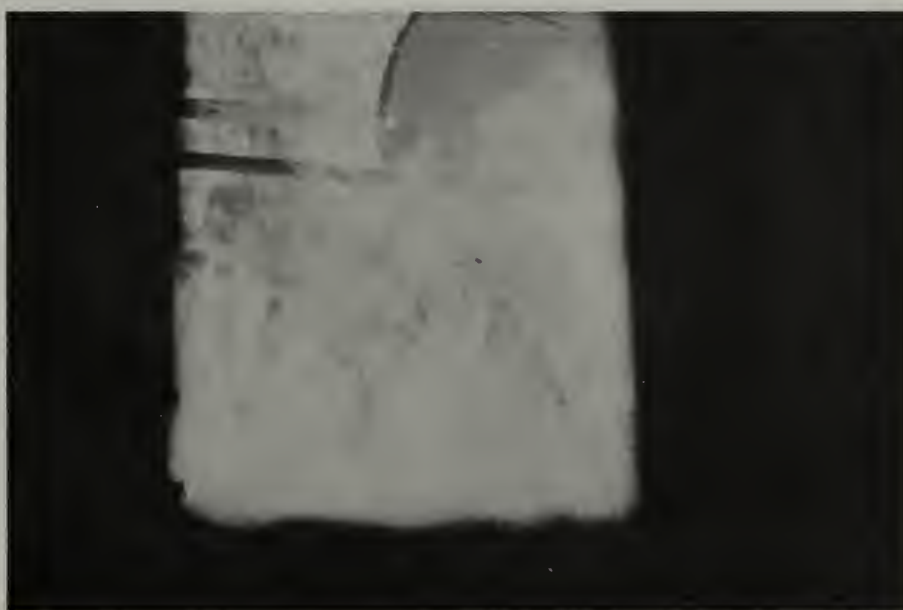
Gypsum boards bowed out and ready to fall down at 62 min.
